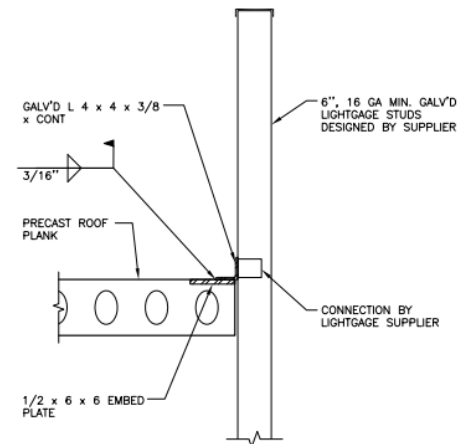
Typical Parapet Section (S12.30 Drawing 11)
